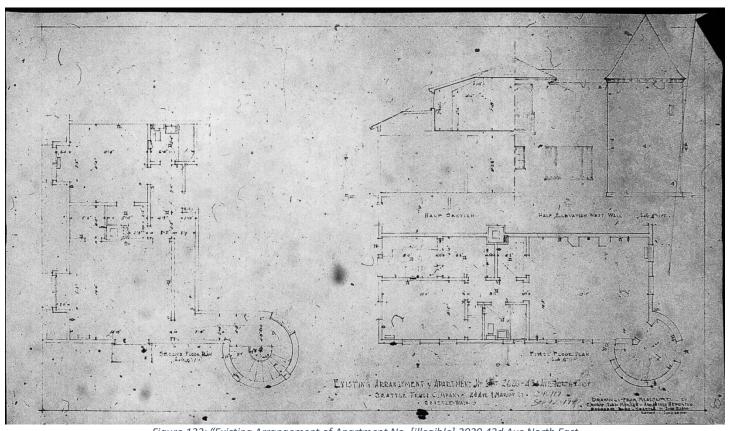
"Existing Arrangement of Apartment No. [illegible] 2020 43d Ave North East Seattle Trust Company ... [Building Permit] 340119, Sep 12 1940"
